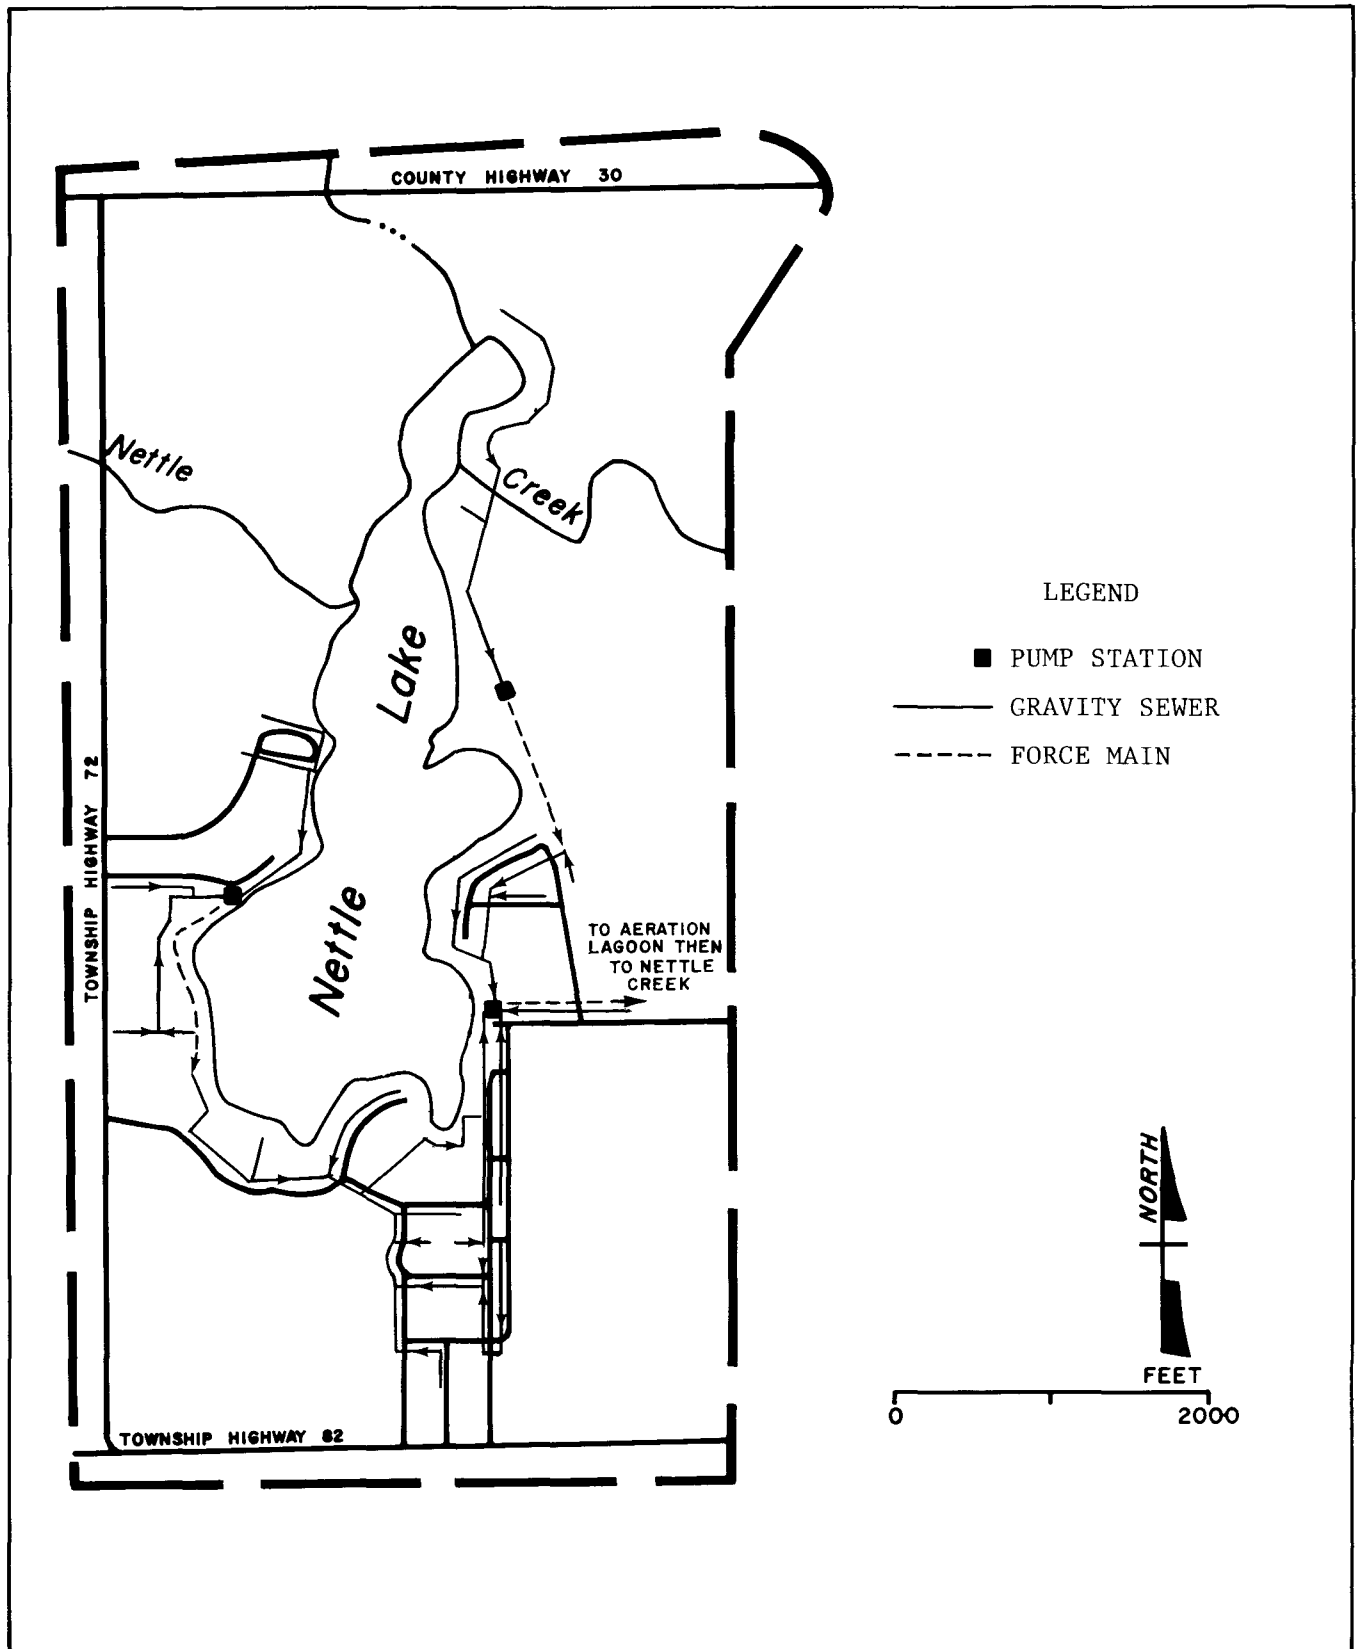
NETTLE LAKE: FACILITIES PLAN PROPOSED ACTION
